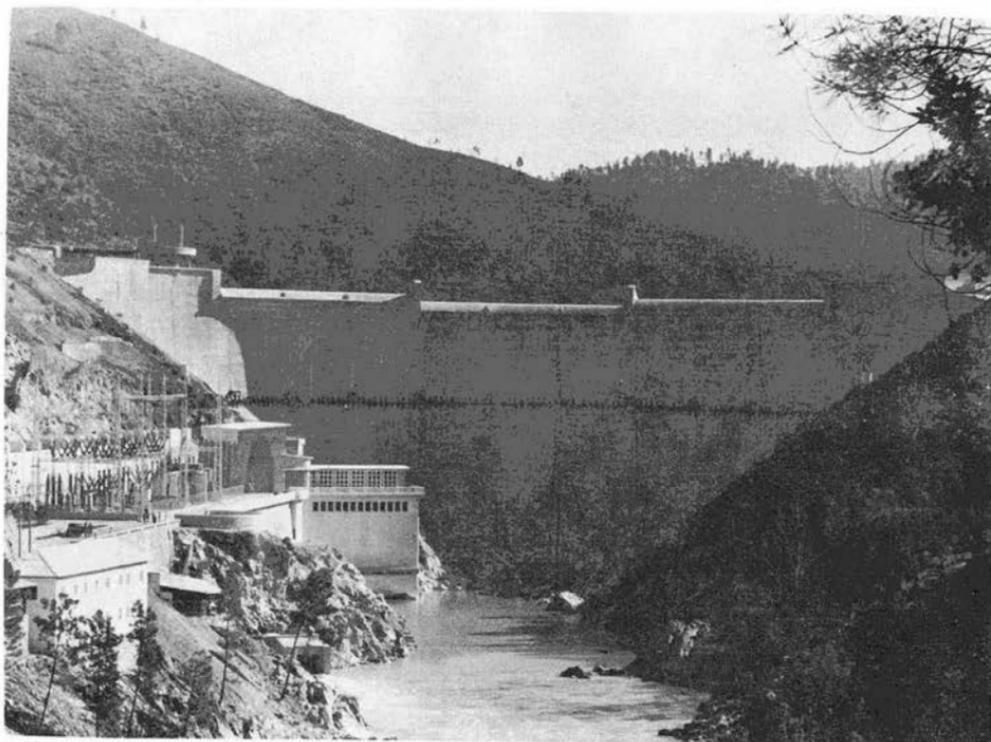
BOUÇA - Downstream view of the dam and power station.
